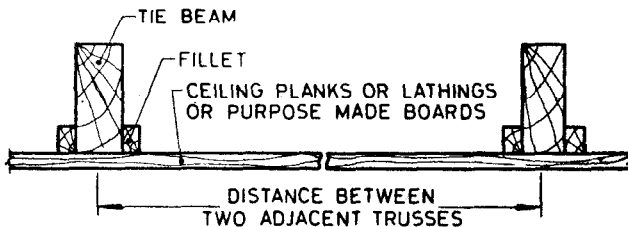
OPEN CEILING BELOW TIE BEAM OF SINGLE SECTION
